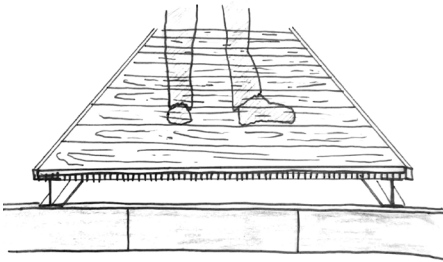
| Walkway detail. As the building slowly decays, the walkway stays intact.
